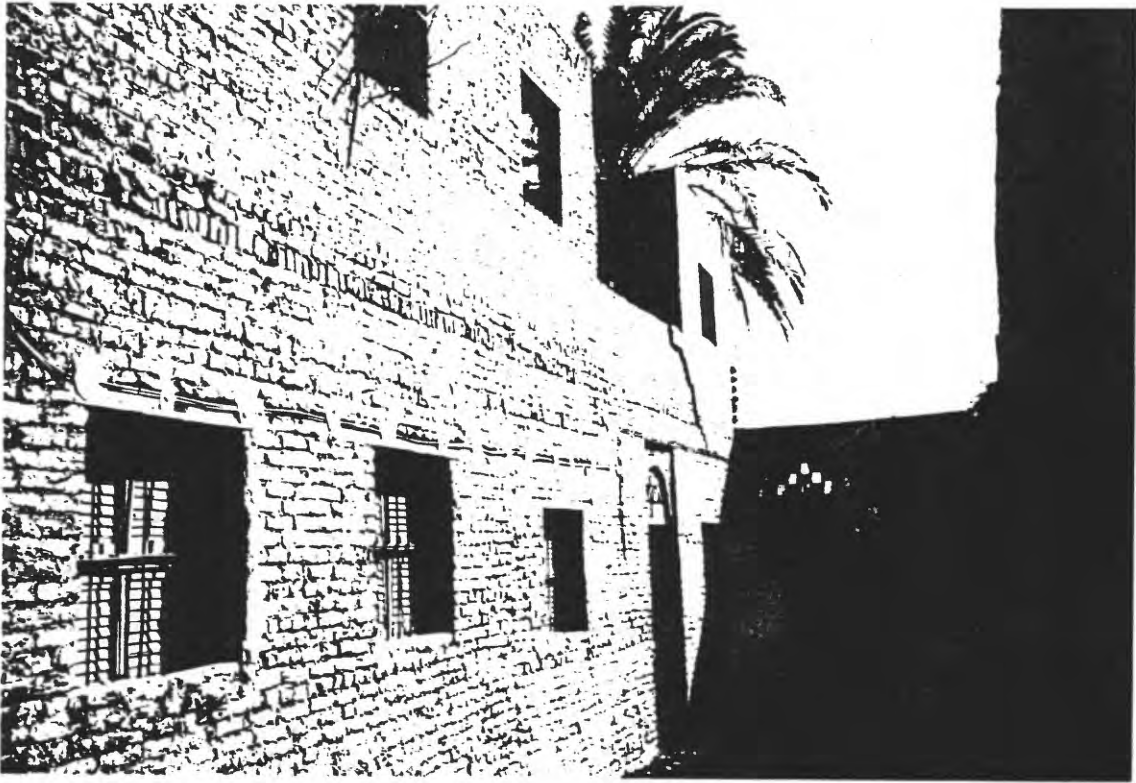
A brick masonry building without timber reinforcement or tie-beams.
